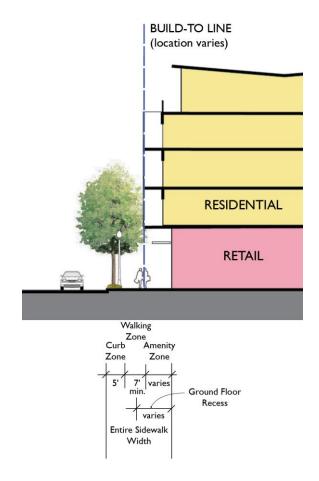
Mixed-Use Residential Building Frontage along Washington
